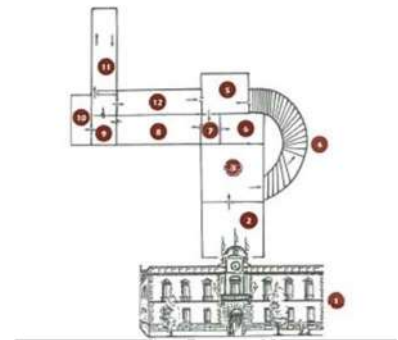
Casa Consistorial - External view and schematic Plan and facade
